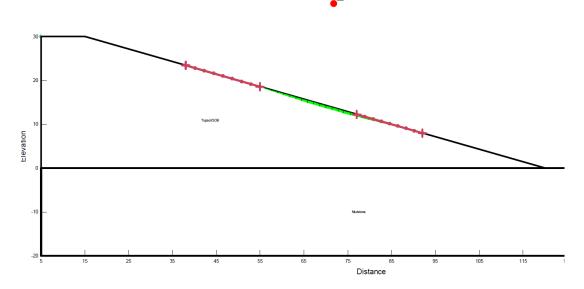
Soft overburden discard dump shallow failure (FOS 2.279)
